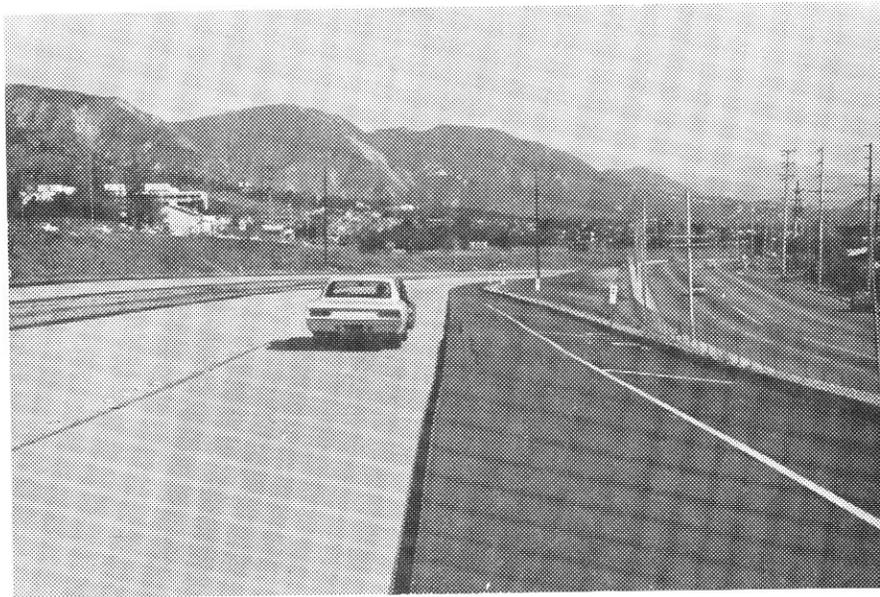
Slab separation and faulting in sidehill fill east of Roxford Street.
